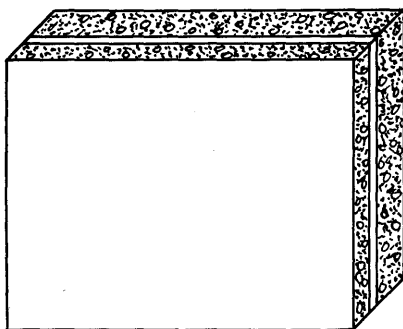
DOUBLE 4-INCH MONOLITHIC WALL
